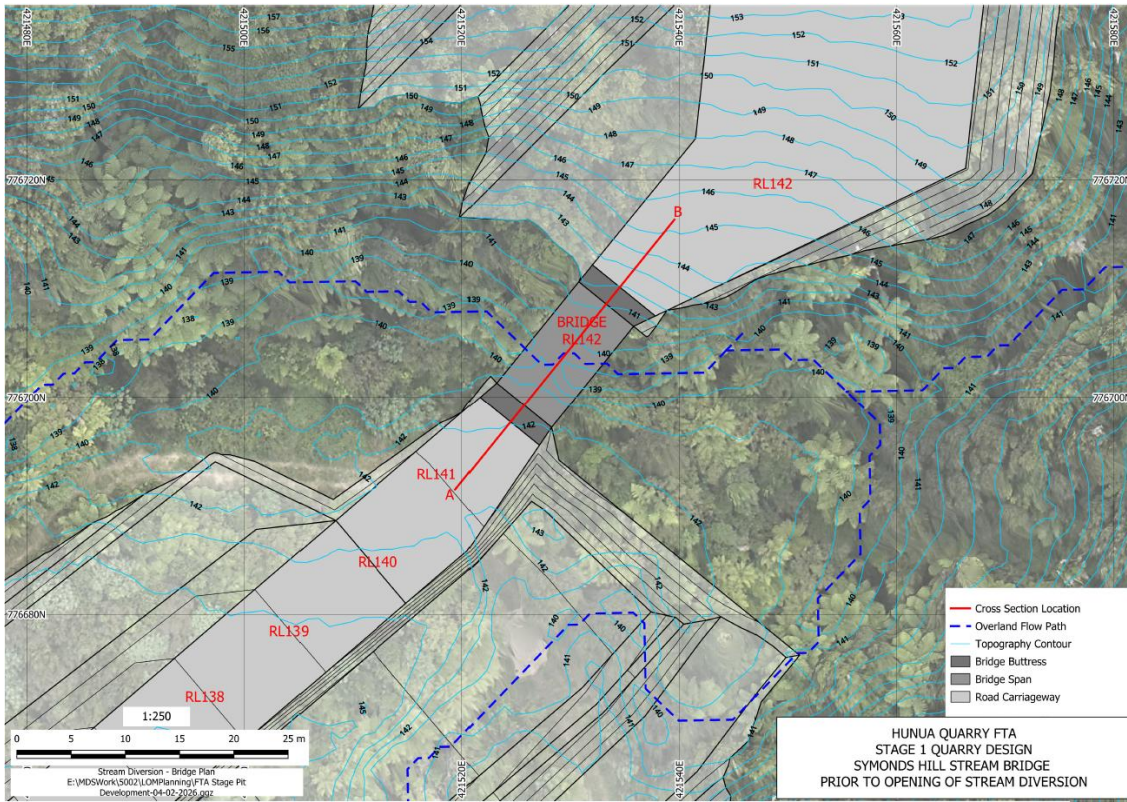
Stage 1 Quarry – Bridge Location and Site Context Plan
